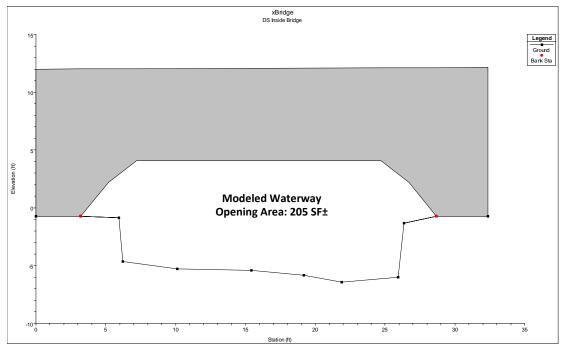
Existing bridge outlet cross-section as modeled to account for sewer main obstruction
